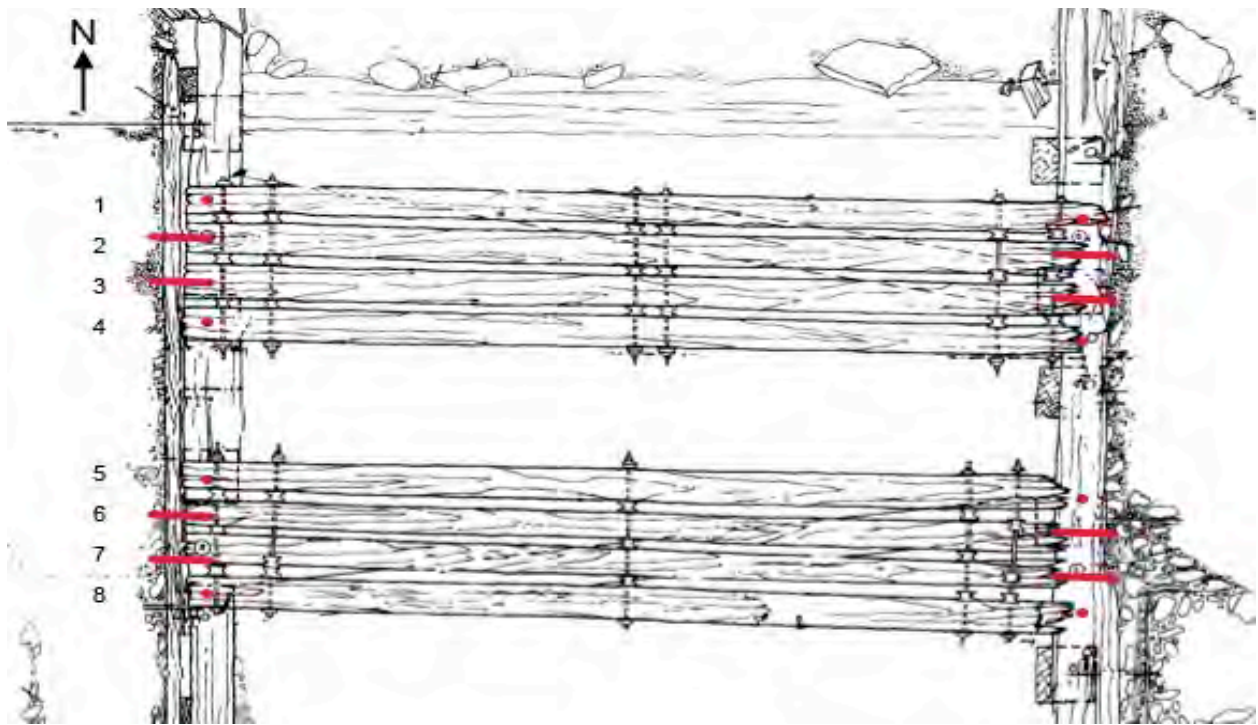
Trestle #1, plan. Approximate location of drift pins used to secure stringer assemblies indicated in red.
